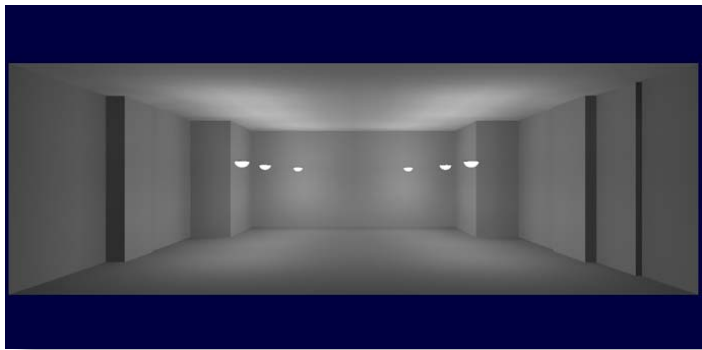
Lighting Calculation: Second Floor North Center Committee Room
